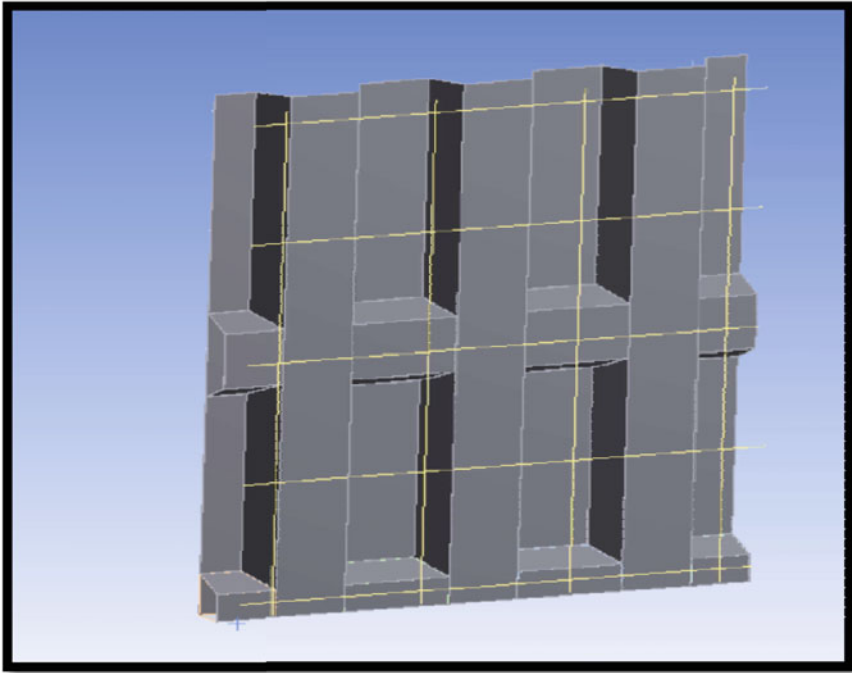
Corrugated steel sheet with reinforcements for scaled model
